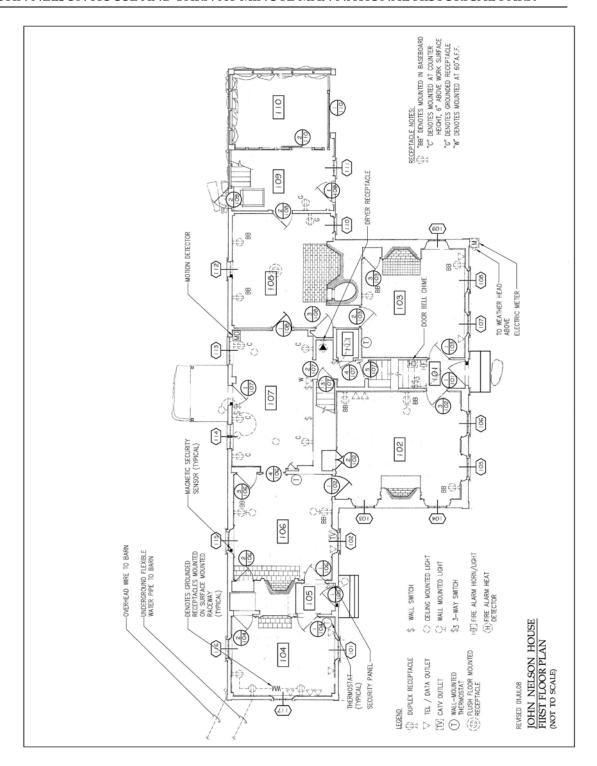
Mechanical, Electrical, and Plumbing key plan, First Floor.
